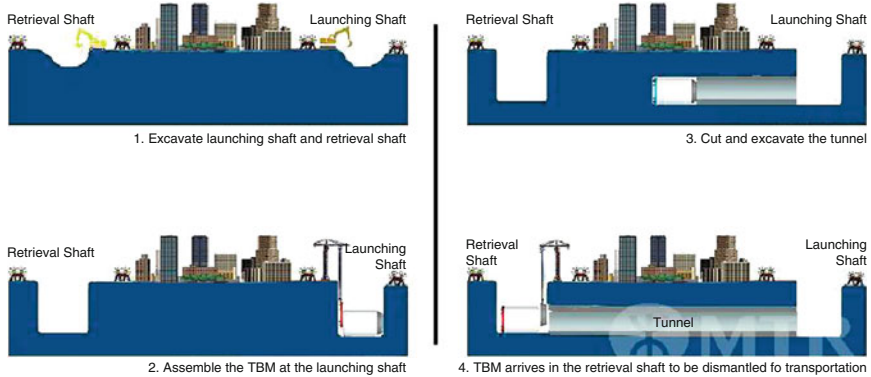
Various stages of excavation using TBM (Ref: <http://www.expressrailink.hk/en/construction/construction-methods.html>)
